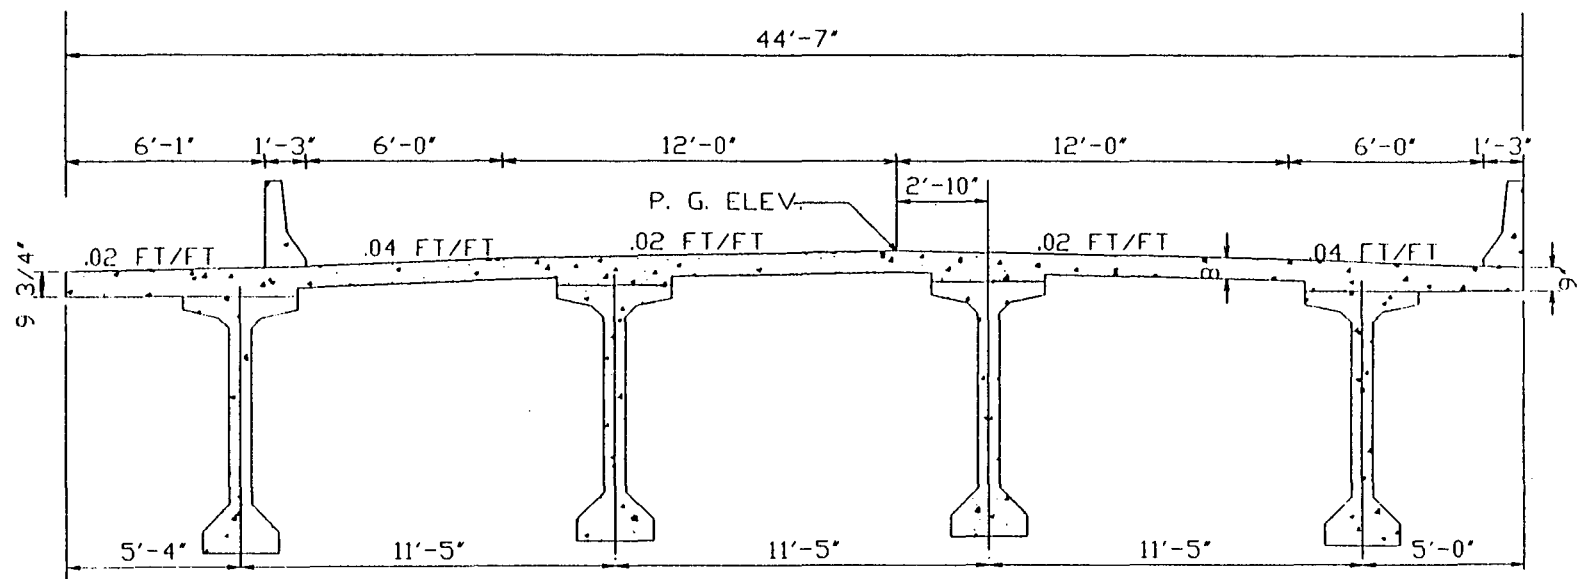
TYPICAL CROSS SECTION OF BRIDGE
